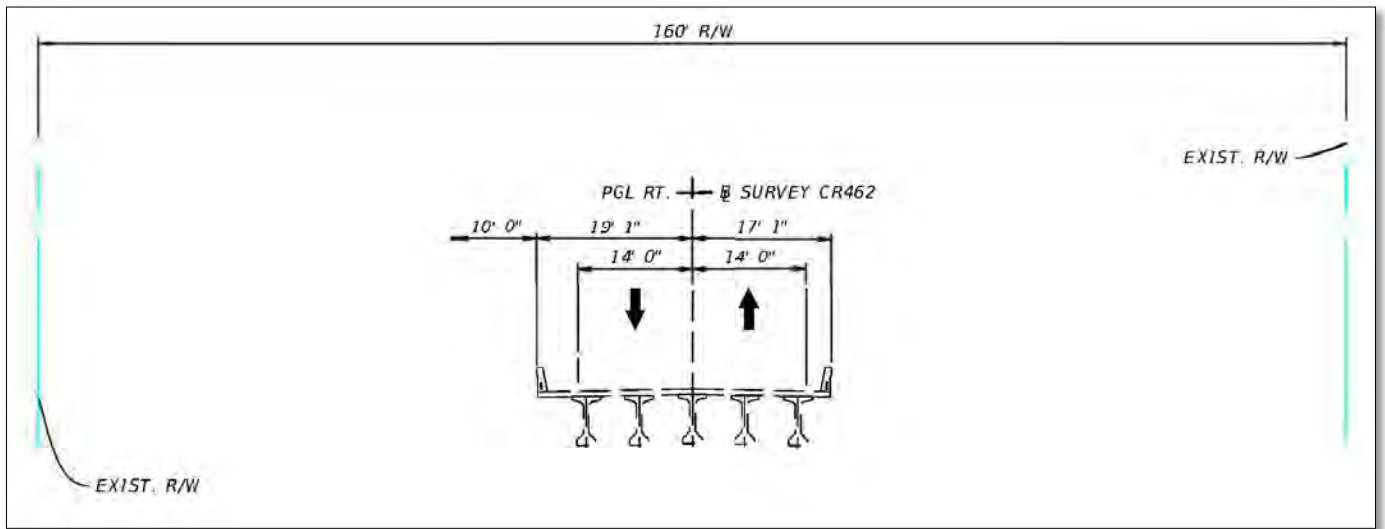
Existing Typical Section of C.R. 462 Bridge # 180047 (Over I-75)
